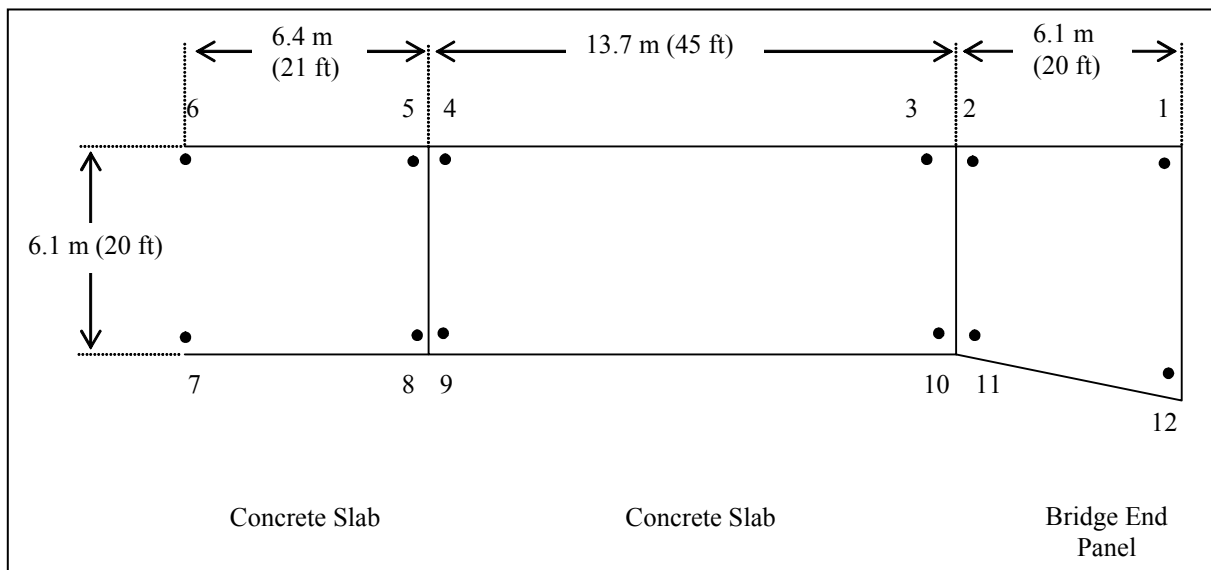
Arrangement of the brass surveying nails used to take elevation measurements
